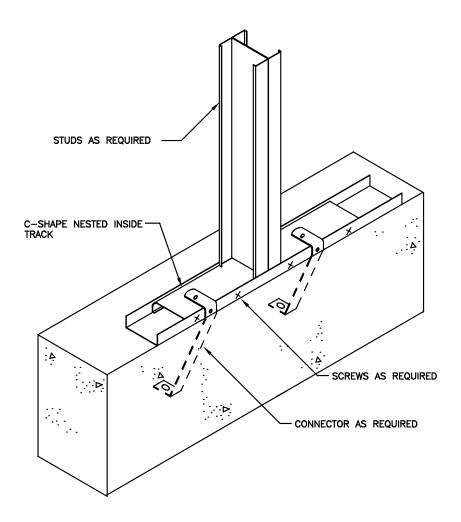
Wall to Foundation/Slab on Grade Connection 4
